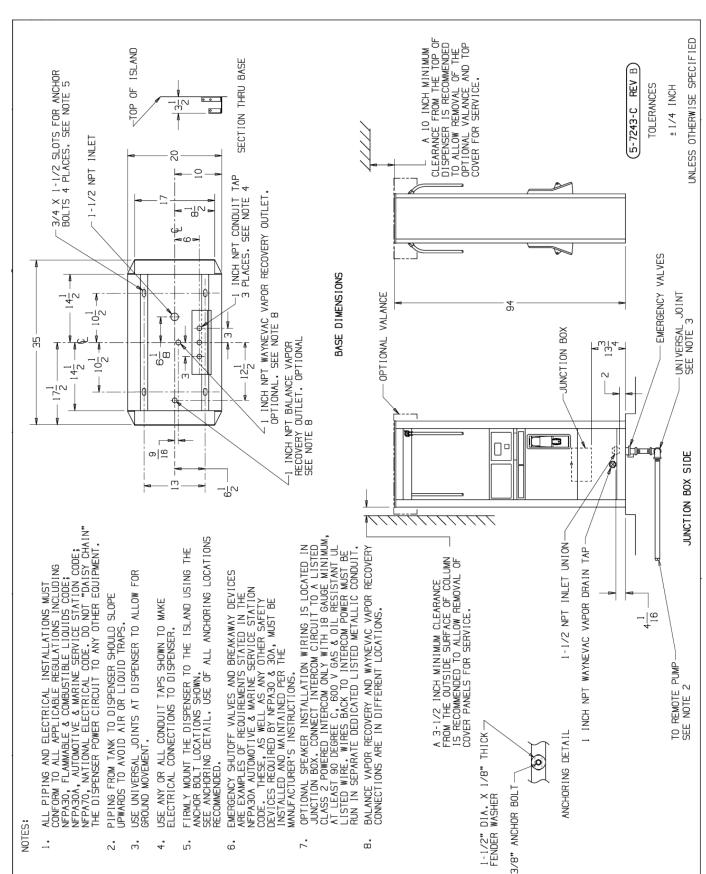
5-7243-C Installation Instructions - 4/V387D (Remote)
